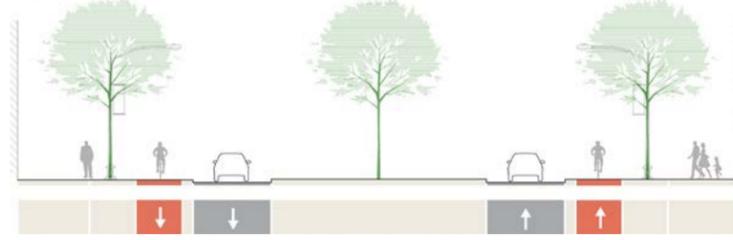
12th Street typical section I-35 to San Jacinto Boulevard
